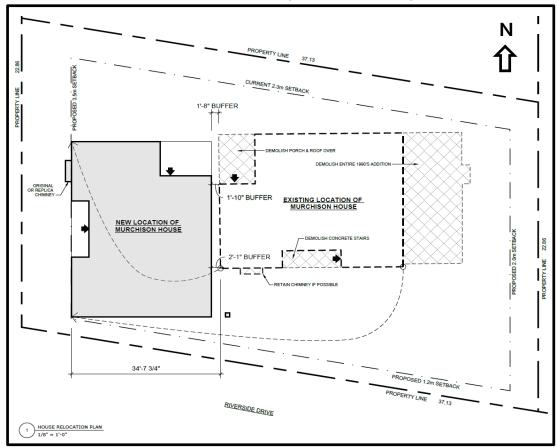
Proposed relocation and orientation of the Murchison House on the subject property.
